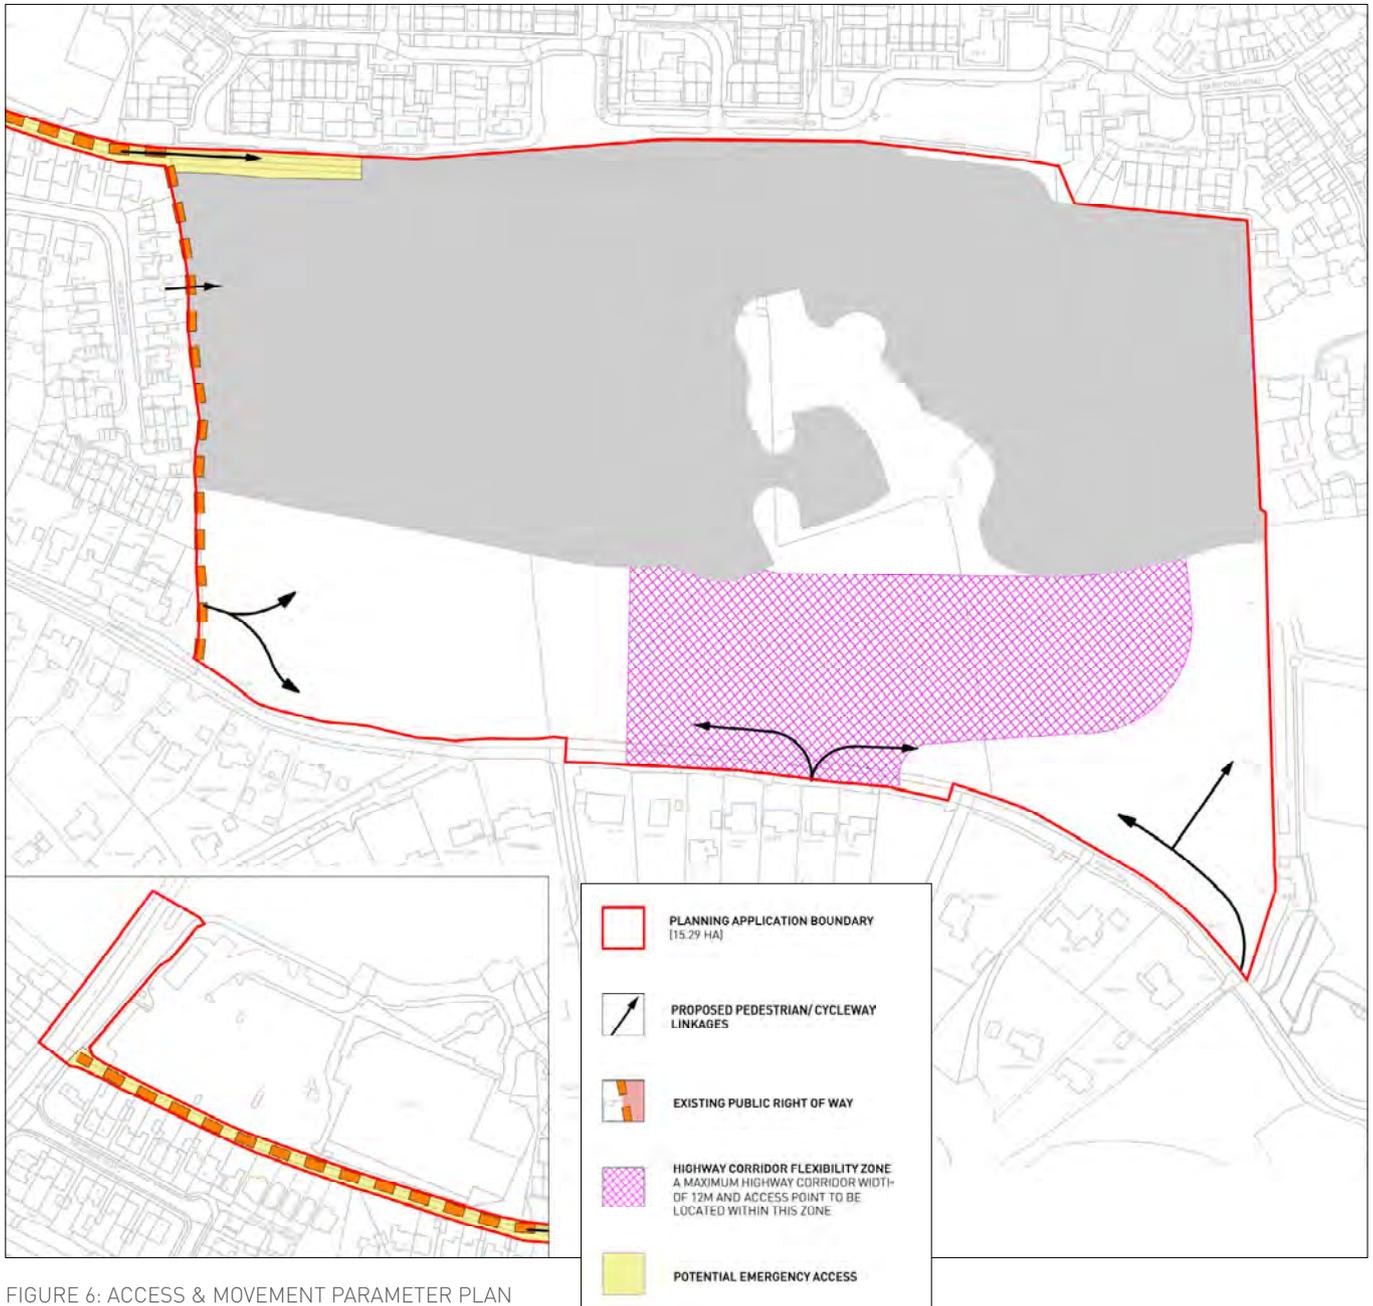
ACCESS & MOVEMENT PARAMETER PLAN
